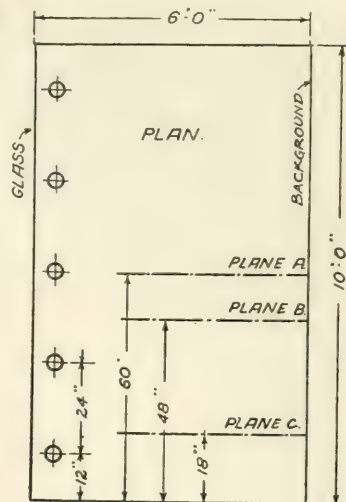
Plan of Class D window showing location of test planes and ceiling outlets.
